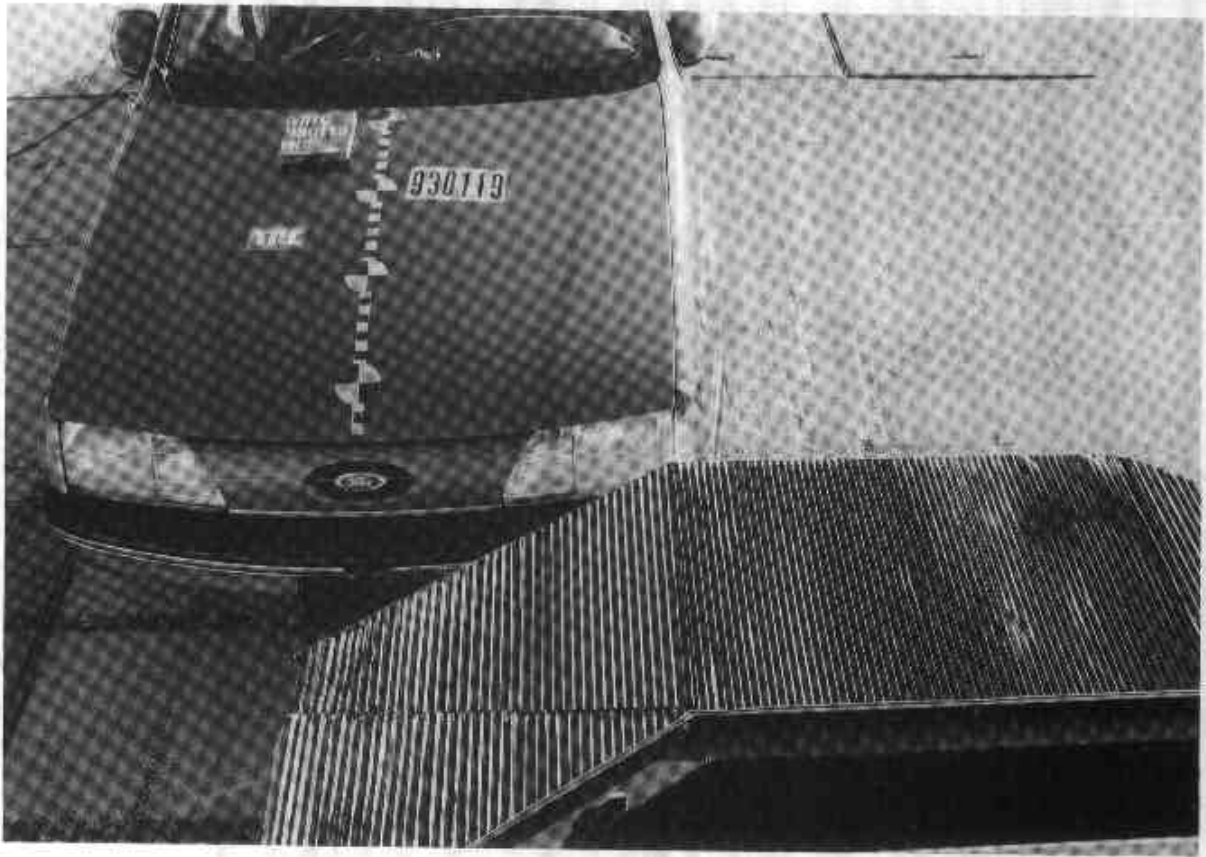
PRE-TEST BUMPER ENGAGEMENT VIEW
